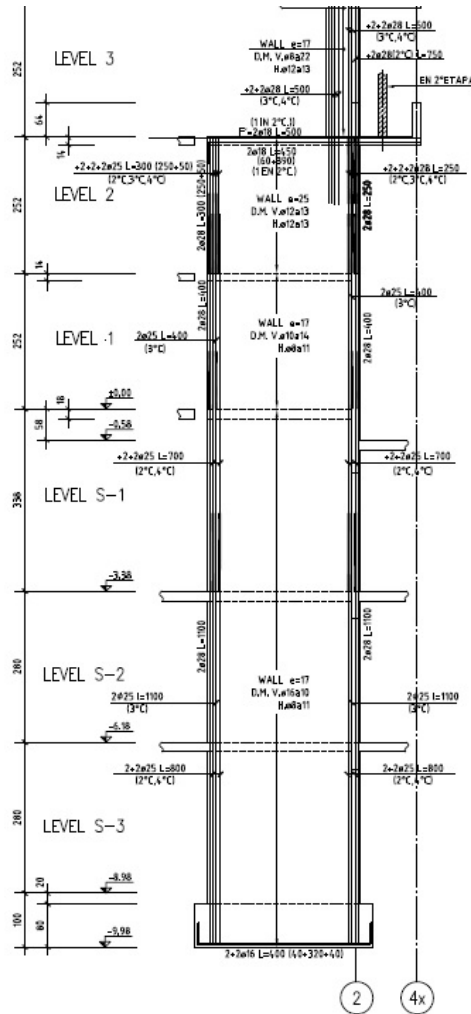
Elevation view of wall K2, dimensions in cm (1 cm = 0.39 in.).
